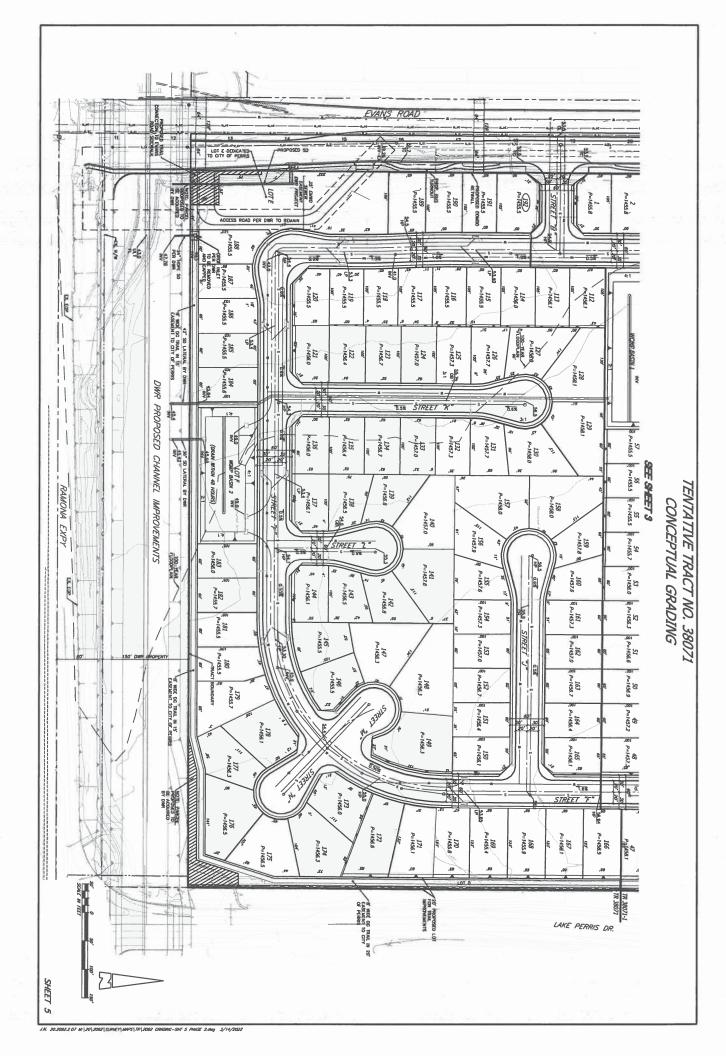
and TTM38071-1 plans and conceptual landscape plans
